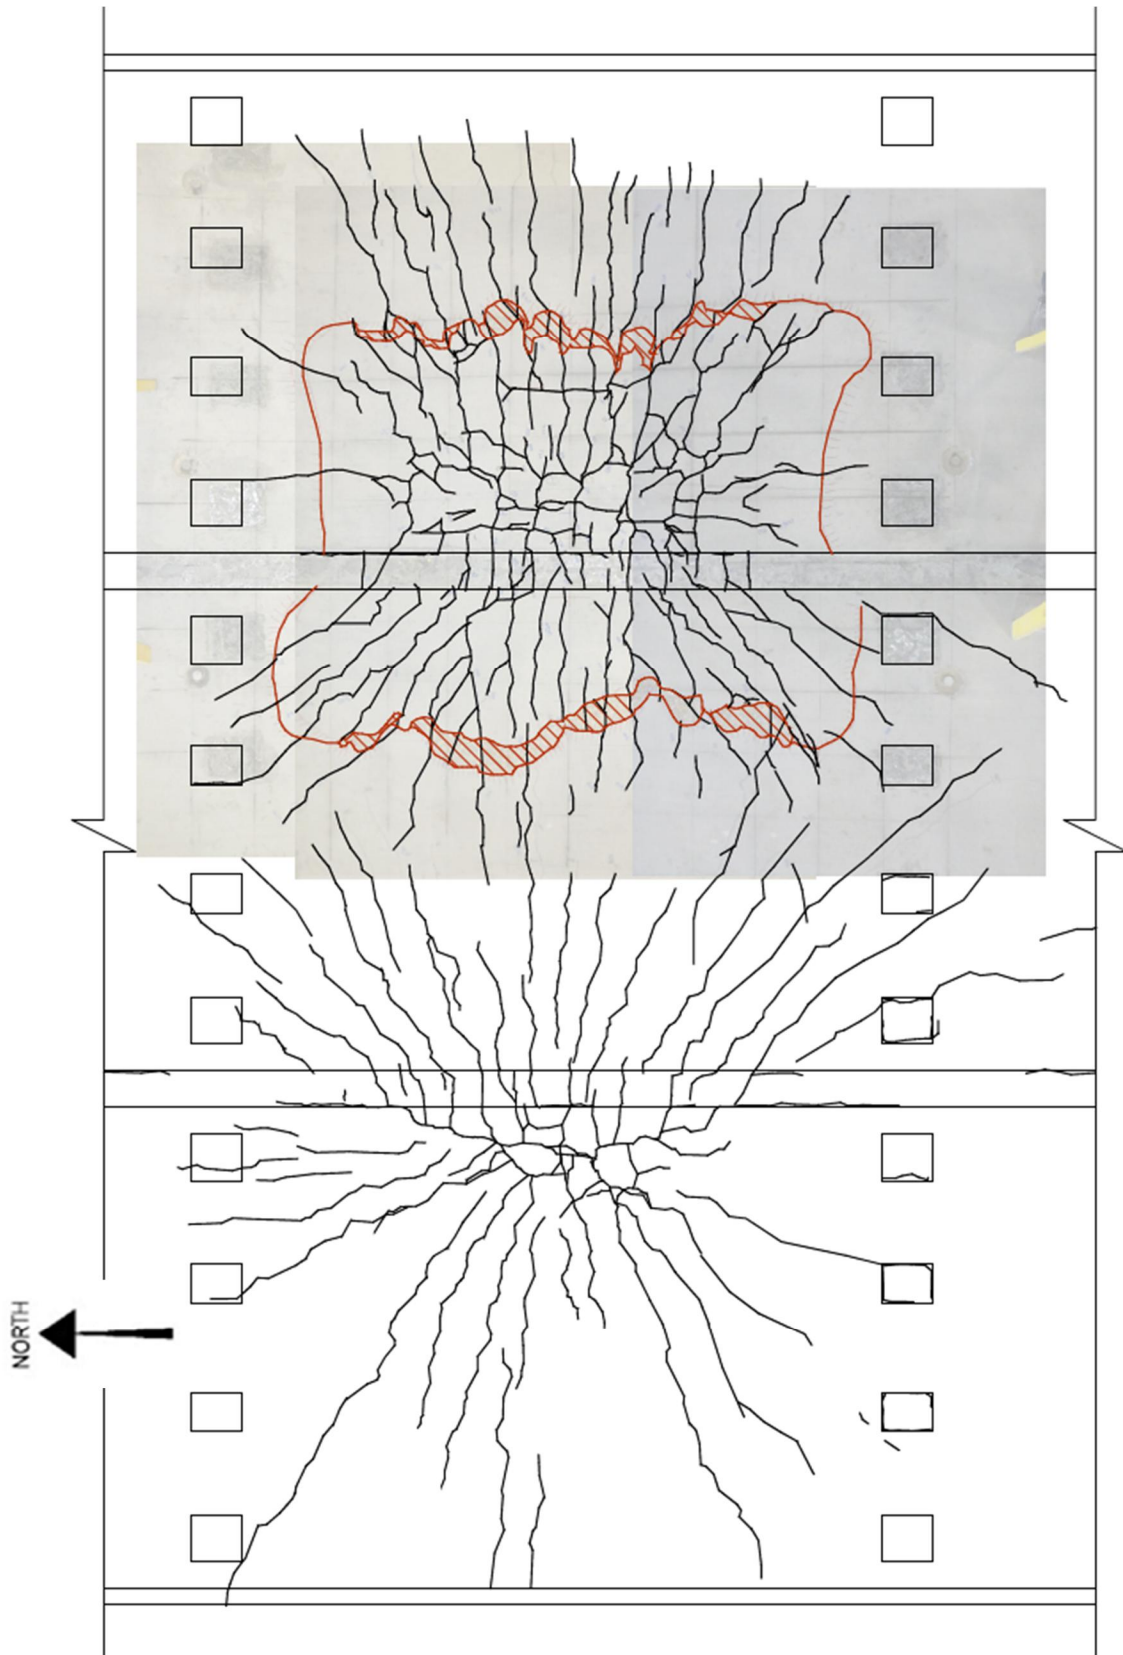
Crack Map at Failure Showing Test #3 Cracks (Test #4)
